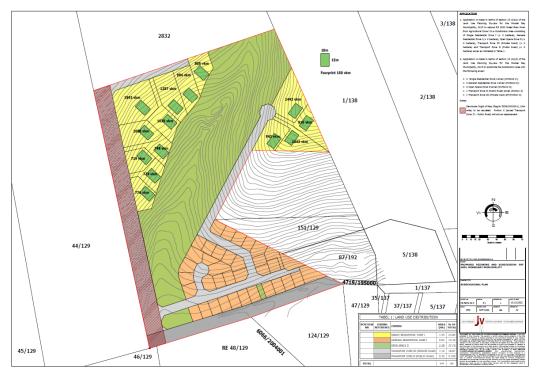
Non-Mitigated Site Development Plan (source: Jan Vrolik Town Planners).
